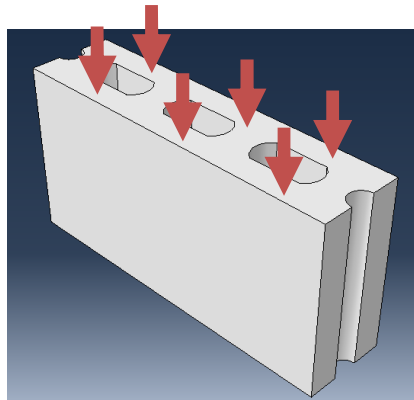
Compressive Strength Test of Concrete Masonry Block
